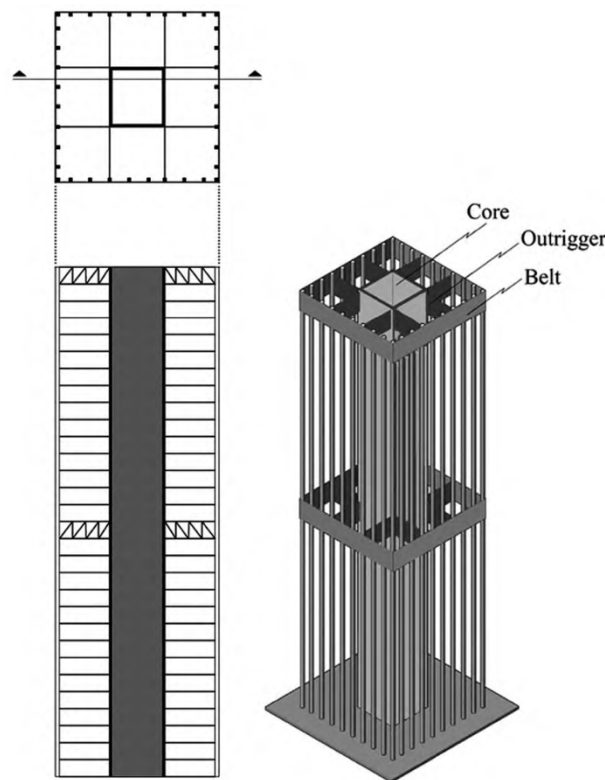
Outrigger frame system and all its components (shear core, outrigger and belt)
